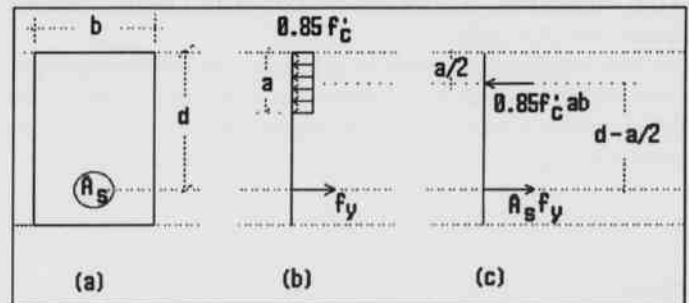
Reinforced Concrete Beam: (a) Dimensions, (b) Stresses, and (c) Forces.
